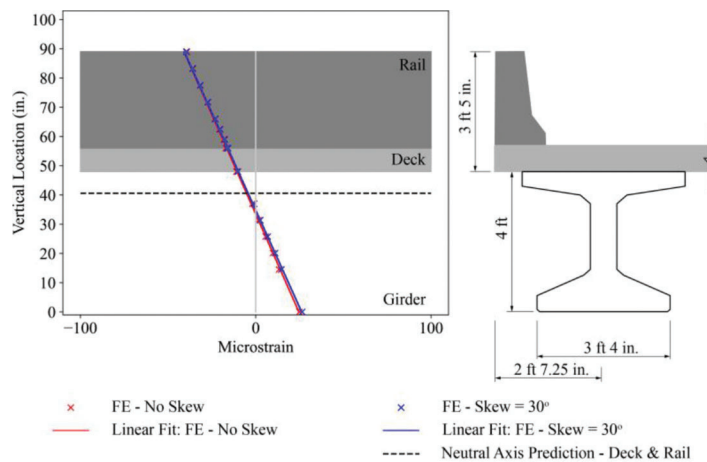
Effect of 30-degree skew angle for two-span continuous prestressed concrete girder bridge with FC rail: FE predictions for strains at peak positive moment location.
